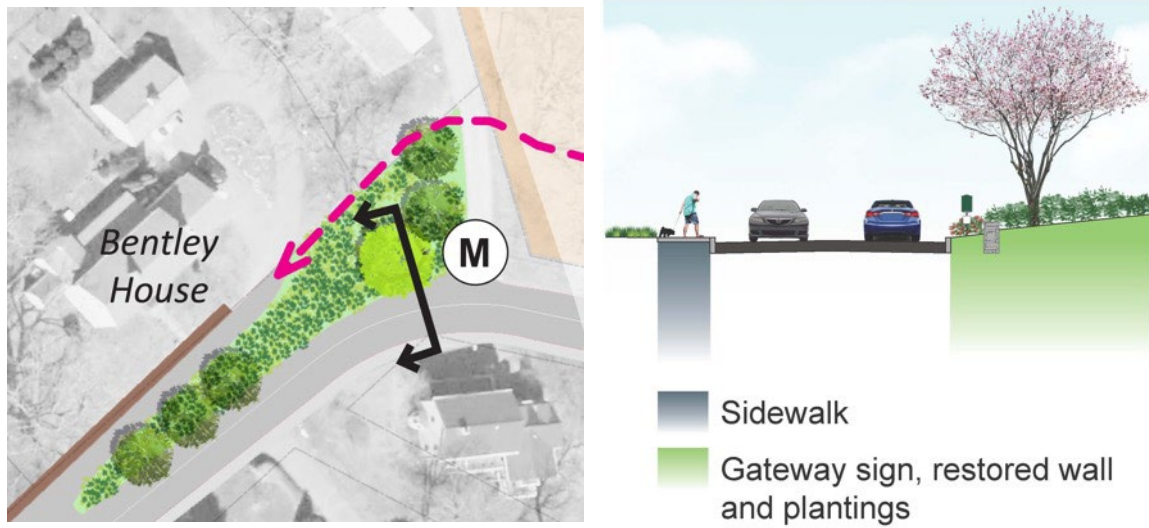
East Market Street gateway located at the highly visible curve from Brighton Dam Road incorporating a restored stone wall and flowering trees and shrubs with the gateway sign
